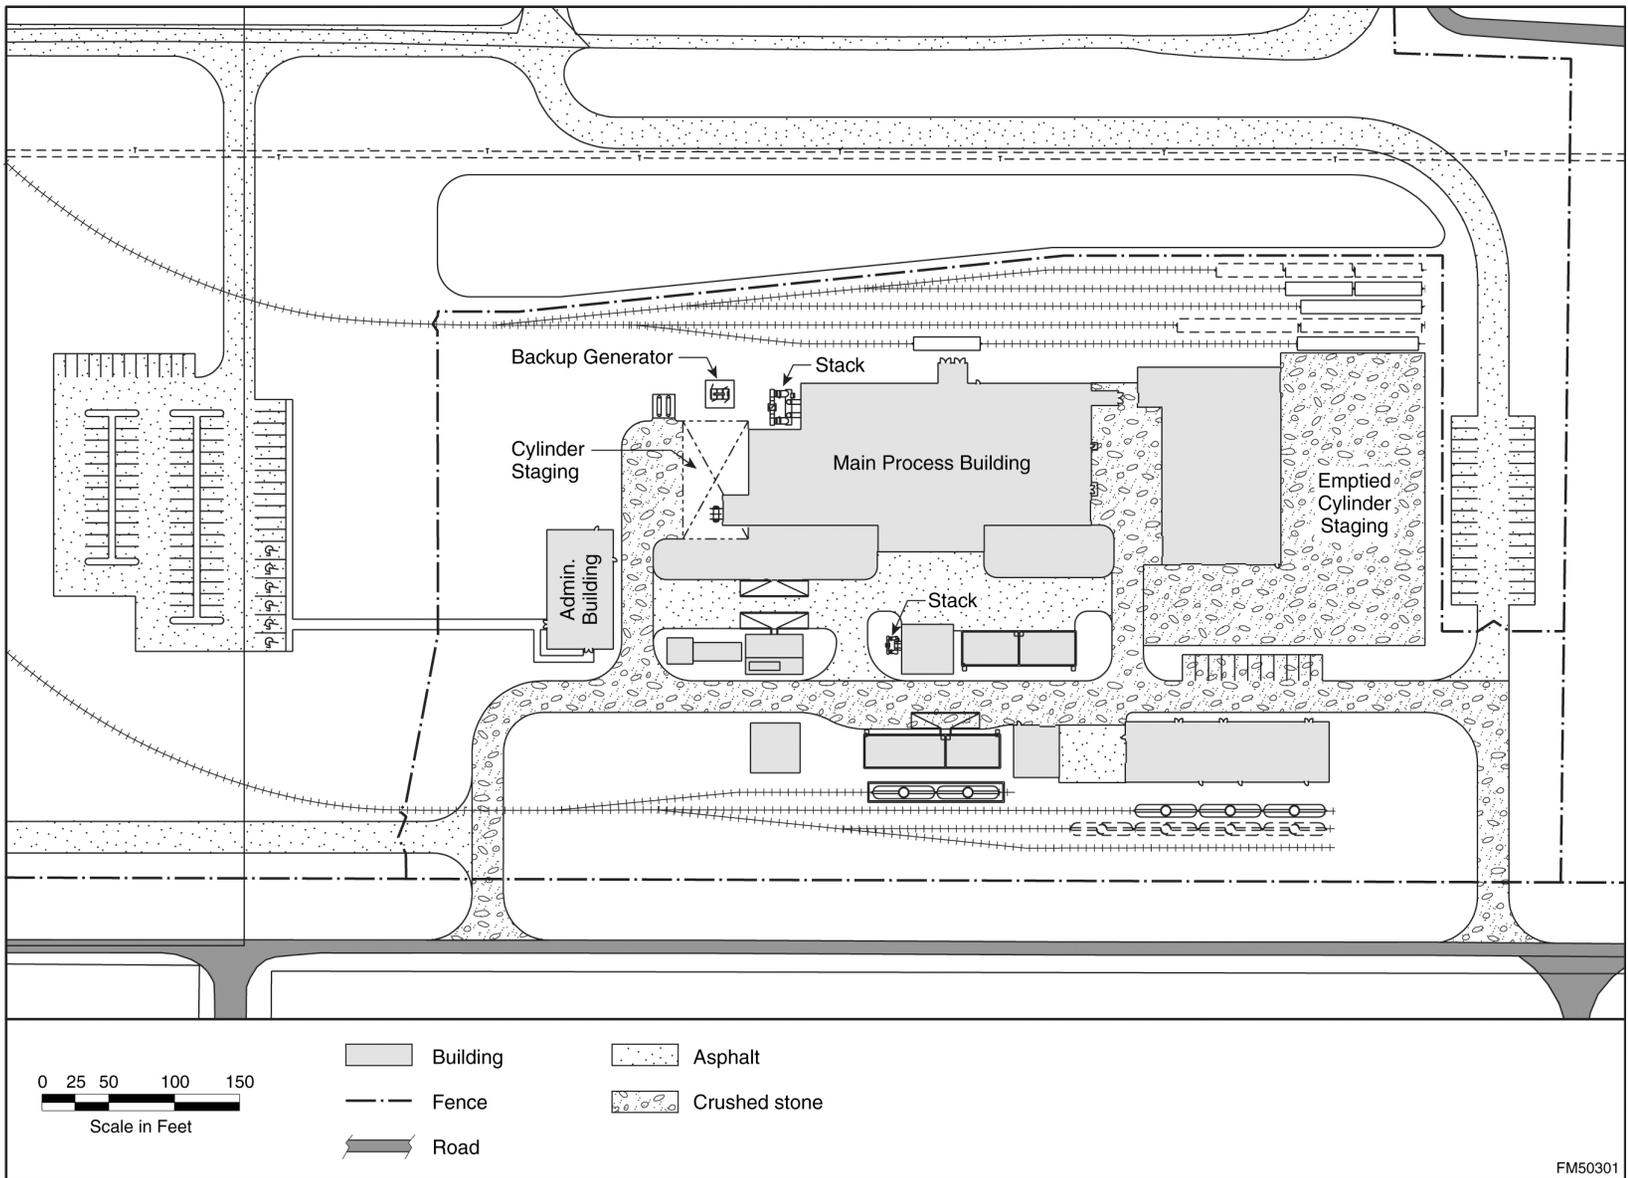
Conceptual Conversion Facility Site Layout for Paducah
